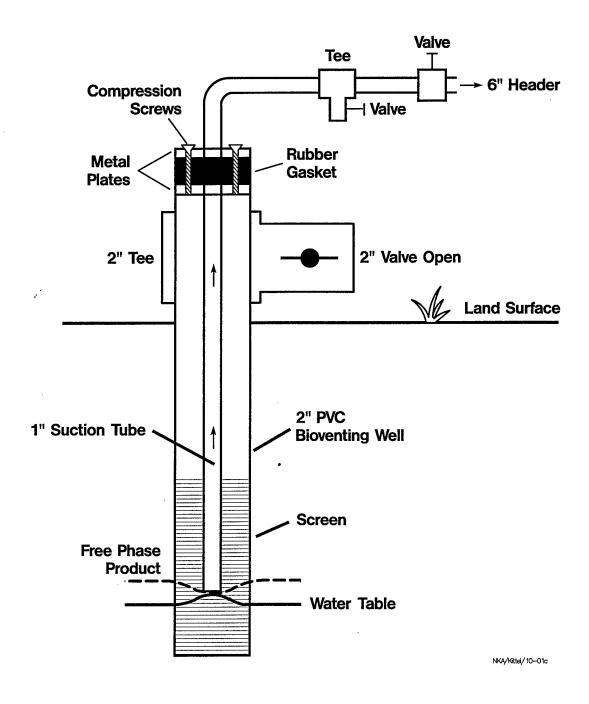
Drop Tube Placement and Valve Position During the Skimmer Pump Test
